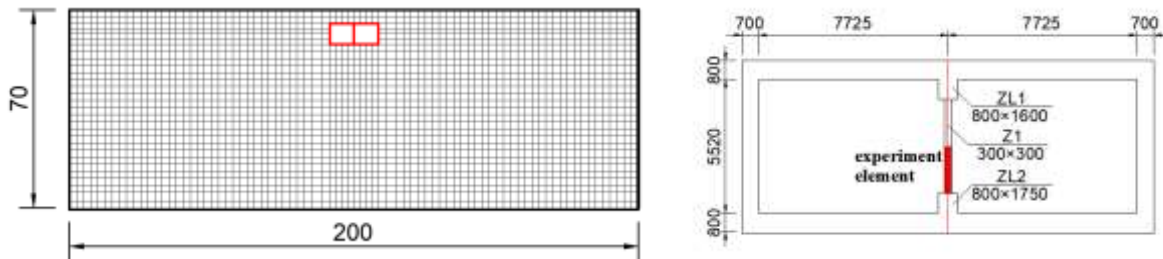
Cross section of soil domain (unit in m) and cross section of station (unit in mm)
